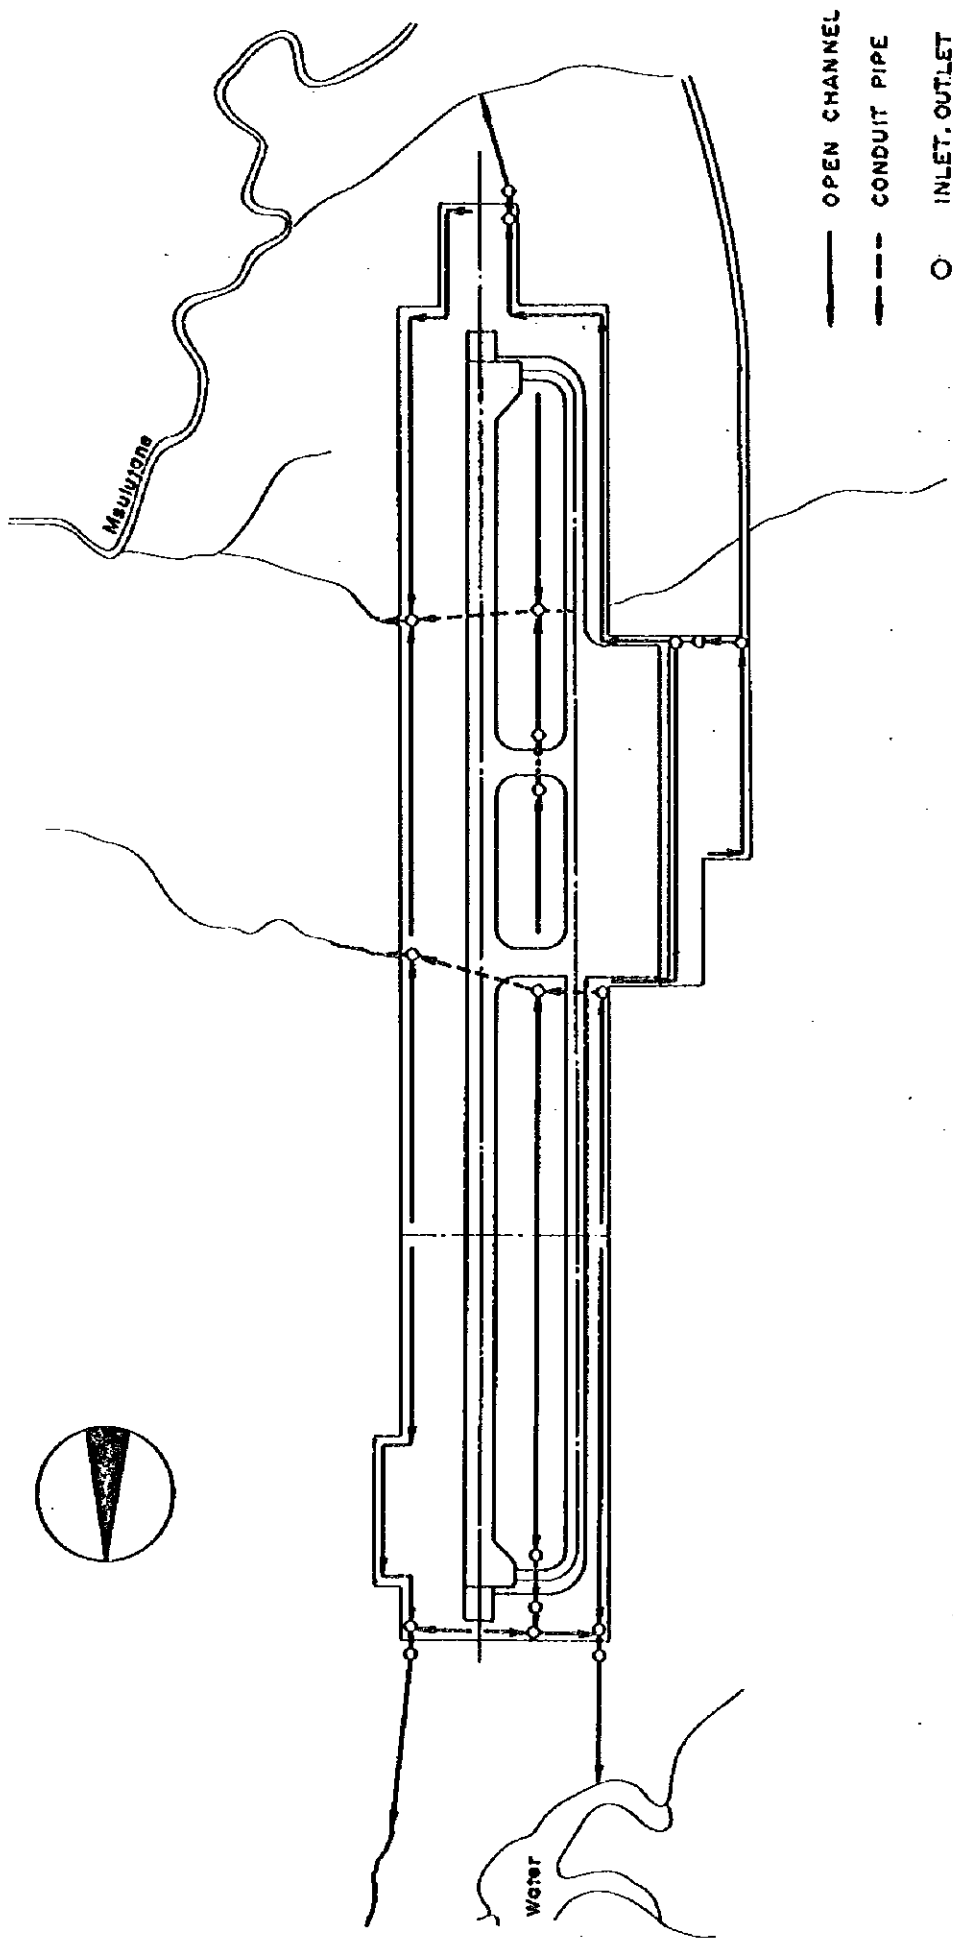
DRAINAGE SYSTEM OF NEW SIKUPE AIRPORT
